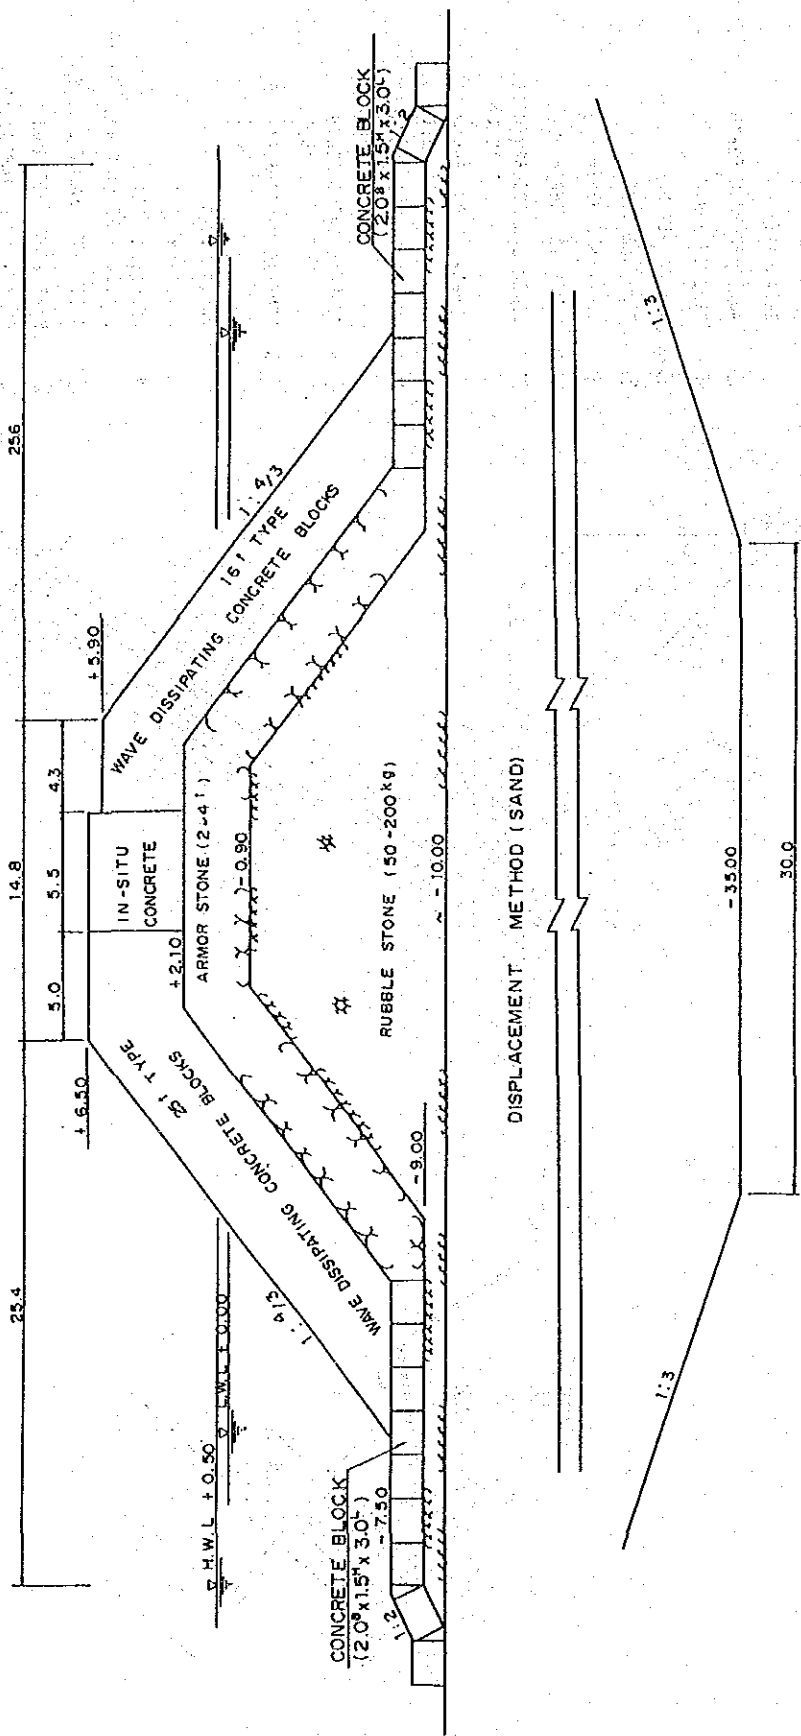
(A-d) ② BREAKWATER (2) (PLAN A AND B) (Unit: m)
